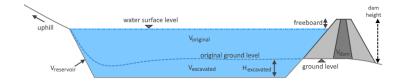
Representational cross-section of a reservoir constructed on a dry gully site.
